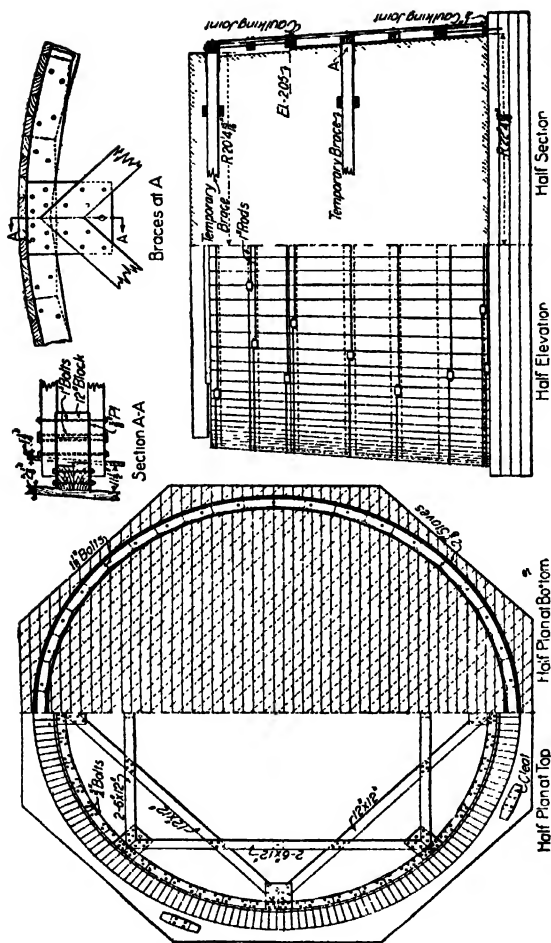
Box Caisson for Pivot Pier of Newark Turnpike Bridge over the Hackensack River.
